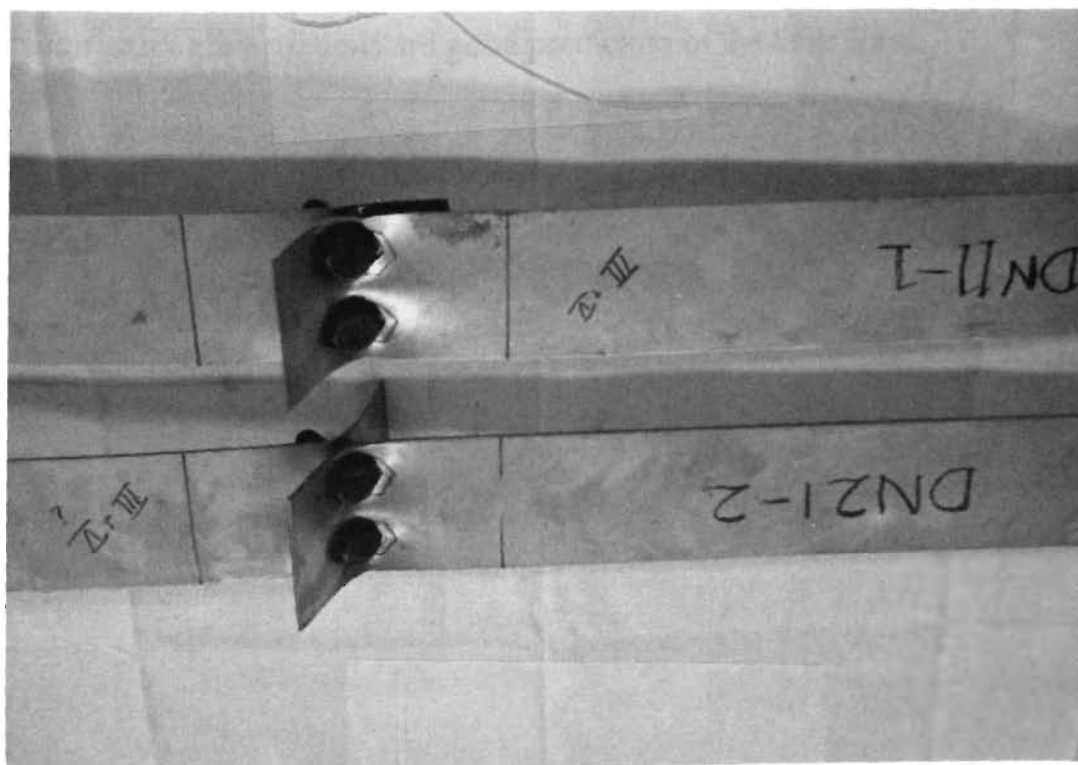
Photograph Of A Typical Test Assembly Failing By Combination Type III And V Failure Mode (Type D Specimens Shown).
